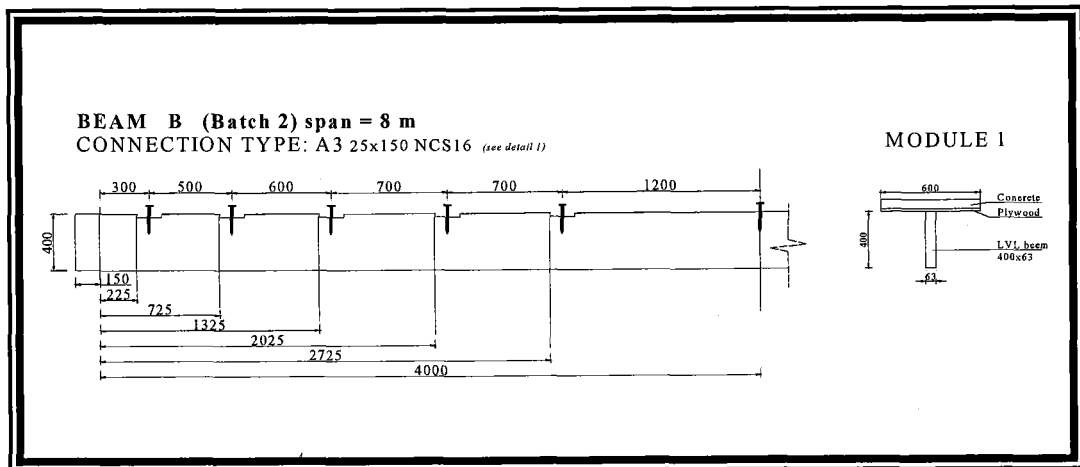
Section of the TCC beam B with connection A3 (narrow spacing)
